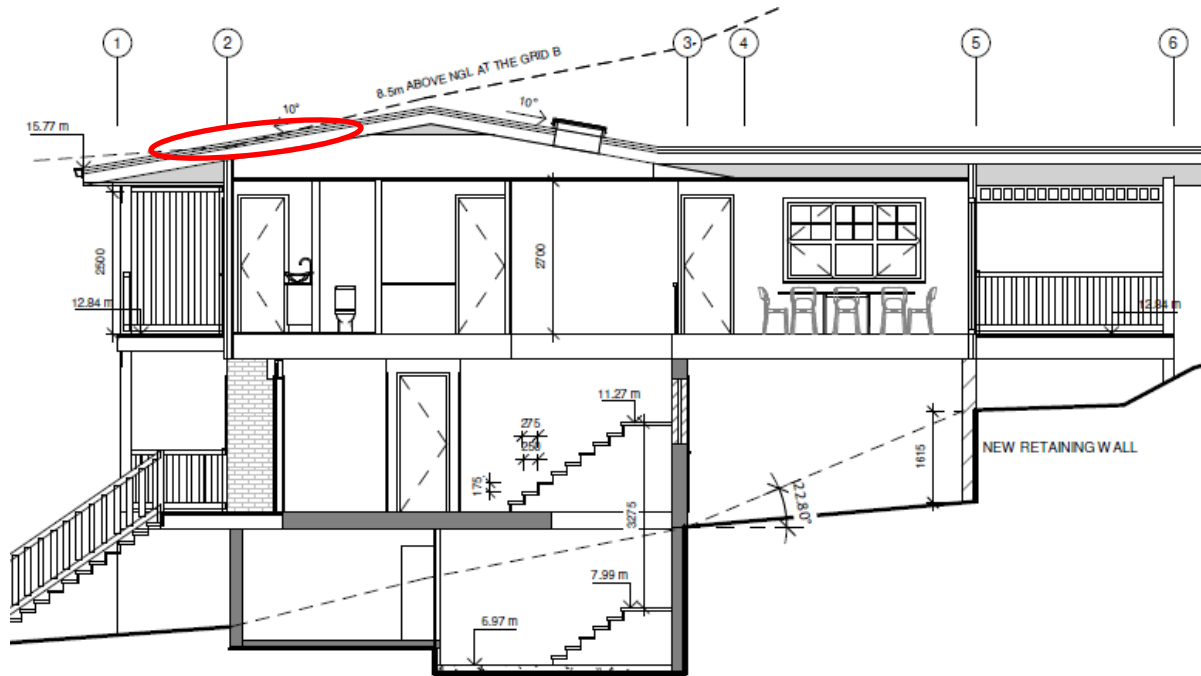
excerpt of the architectural plans showing the extent and location of the building height exception
